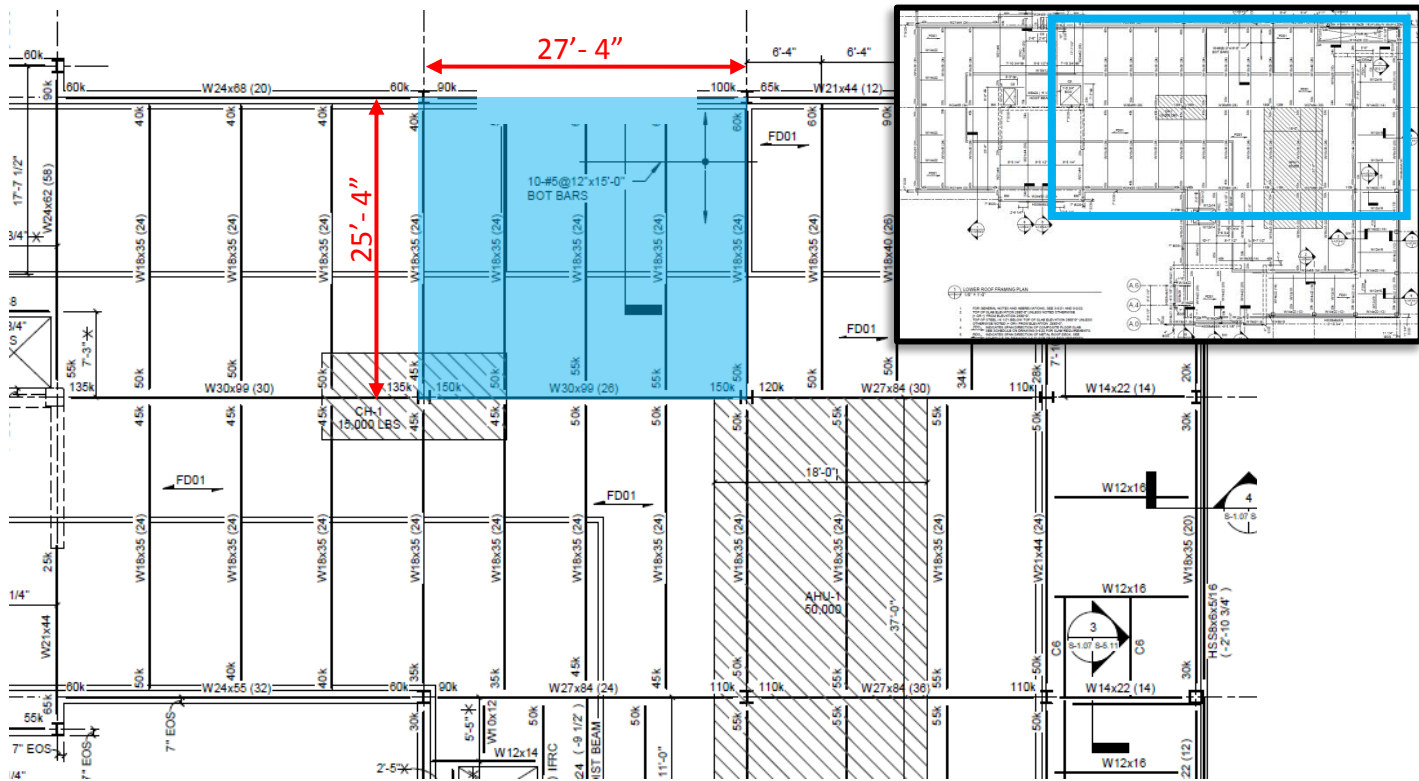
Lower Roof Framing Plan Showing Typical Bay (Sheet S-1.07)
